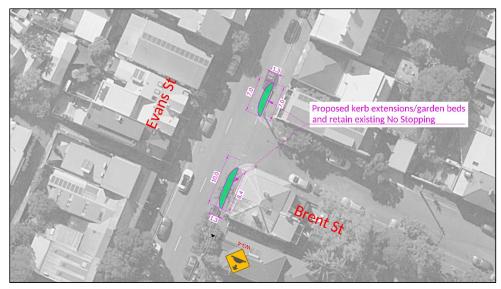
Evans Street/ Brent Street T-intersection proposal.
